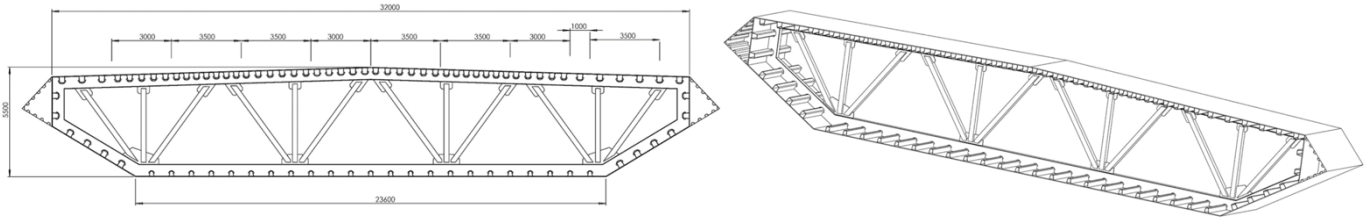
The cross section and 3D image of the plate concept bridge girder (Olav Olsen, 2019).
